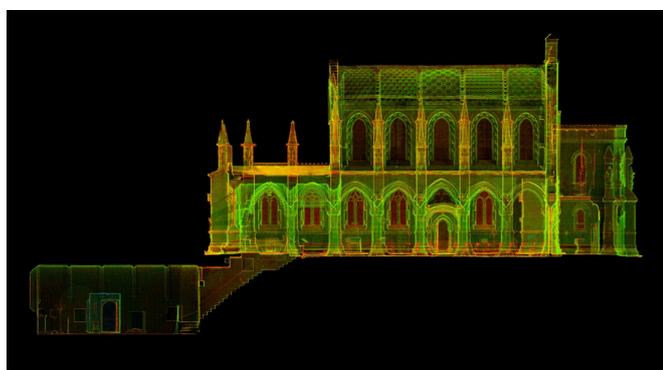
Ortho-rectified point cloud elevation of Rosslyn Chapel showing some internal structures and vaulted crypt.
